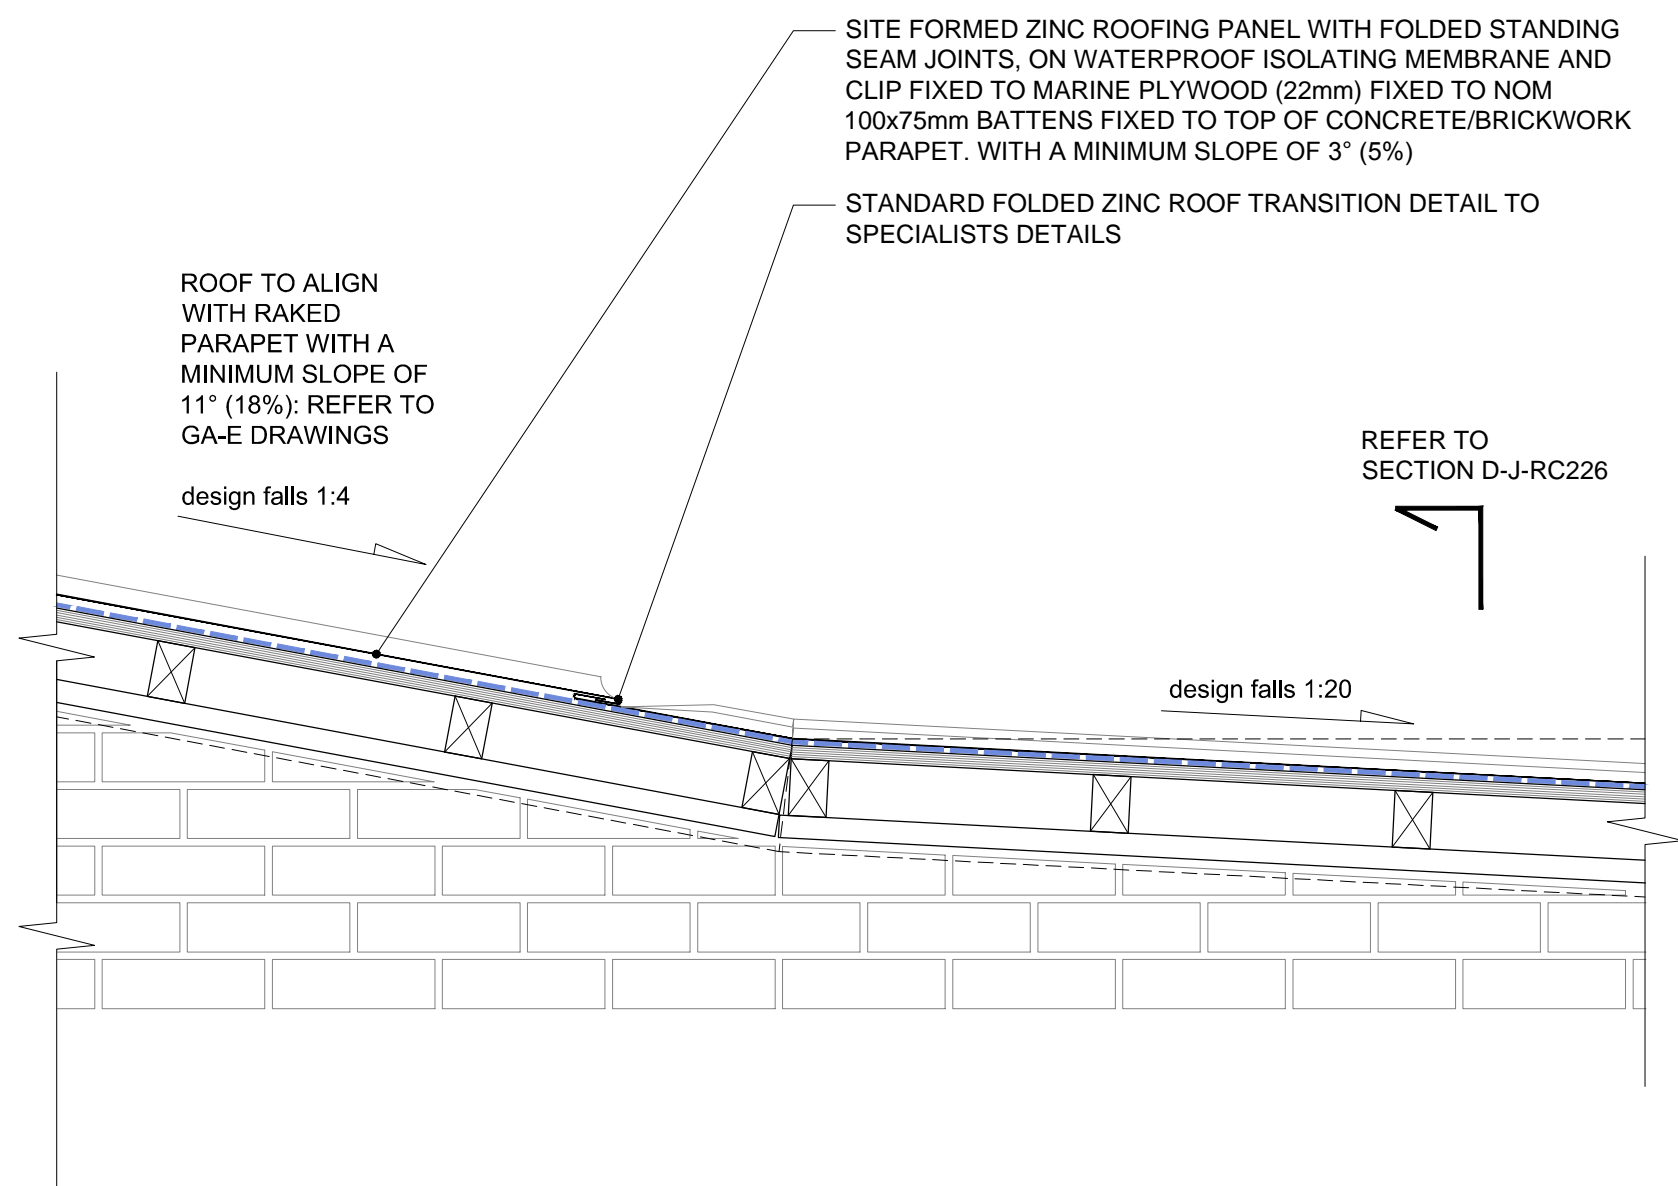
DETAIL - Block C - D-J-RC225 - Through fall in roof/parapet (L05 GL D-05/06)
